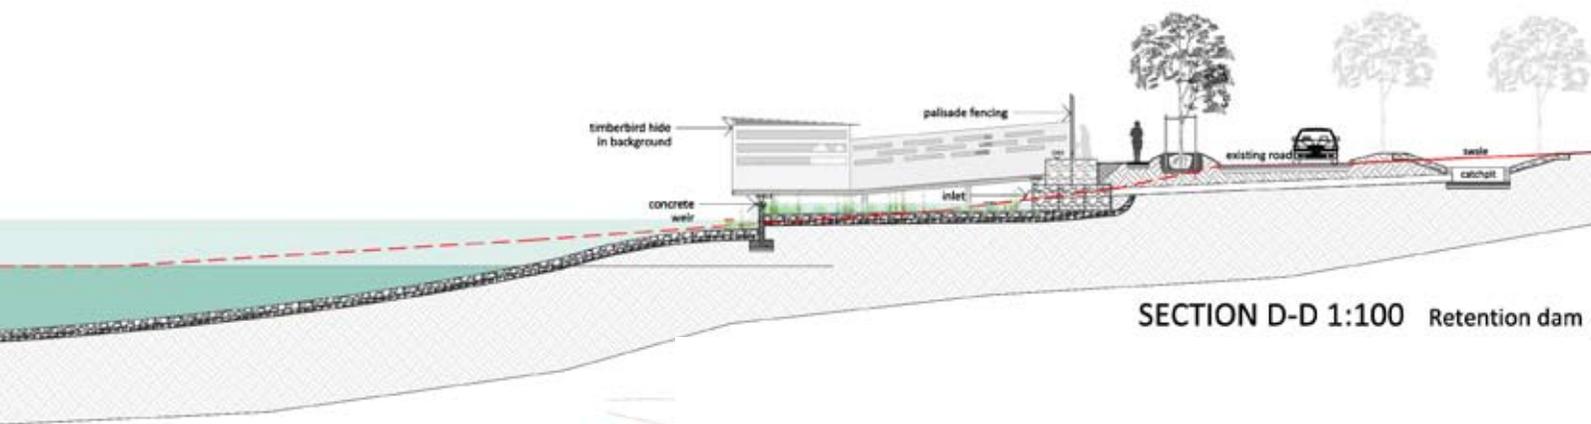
Section through Retention dam 1 (Author, 2009).
